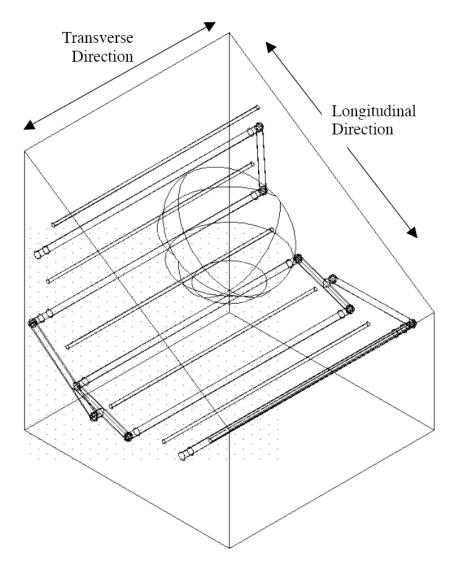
Diagram of Angled Pavement Block with rebar, cooling pipes and pothole (9)
